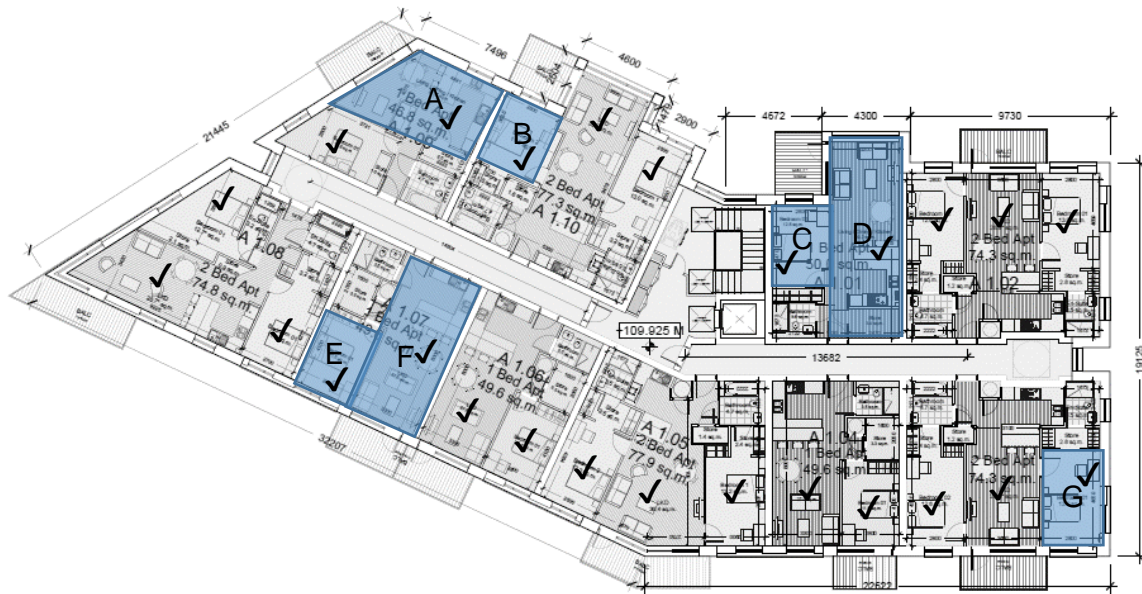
Block A – First Floor Assessed Rooms Highlighted in Blue
